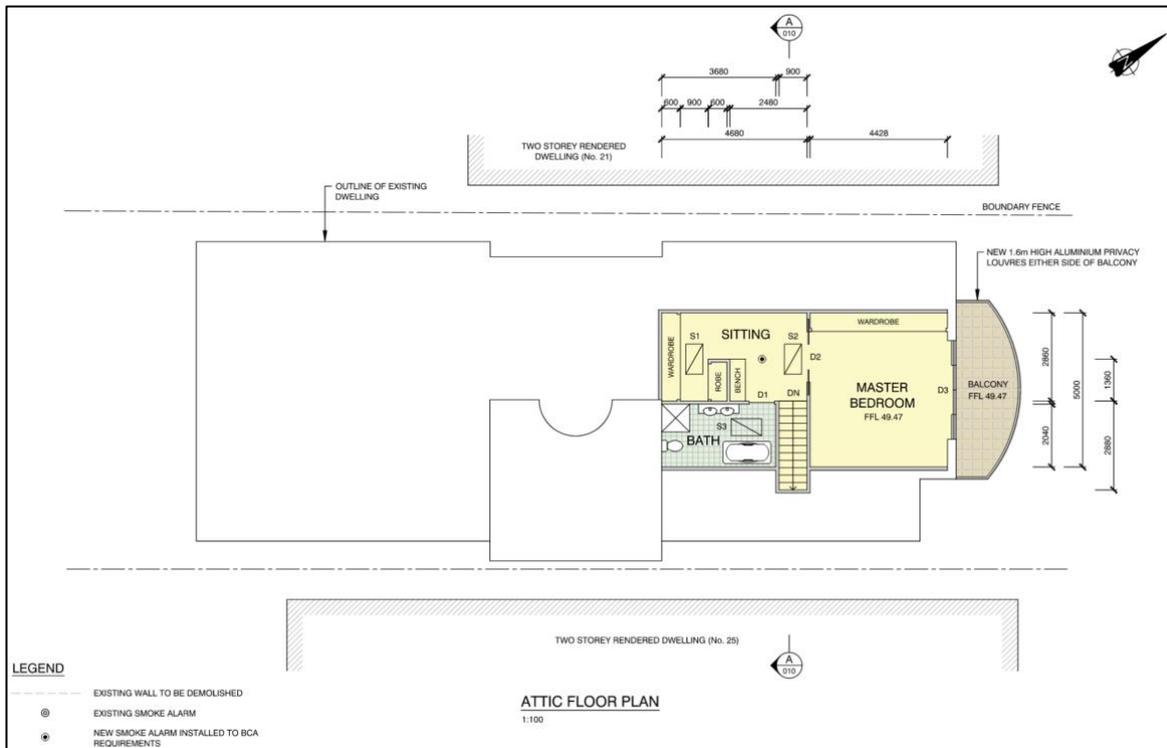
Proposed Attic Floor Plan (Source: Paterson Designs).
